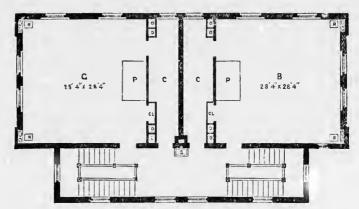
,-Plan of the First Floor, adapted to Fig. 143.
